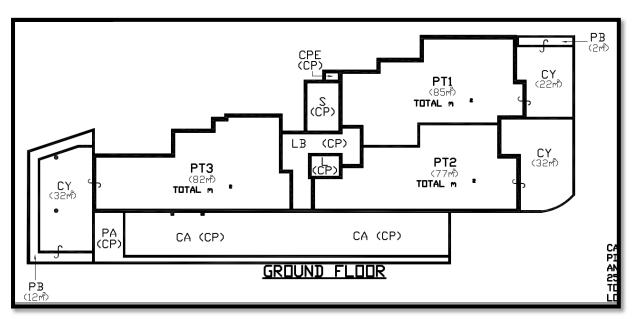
Extract of the proposed ground floor strata subdivision, dated 21/04/2021.
